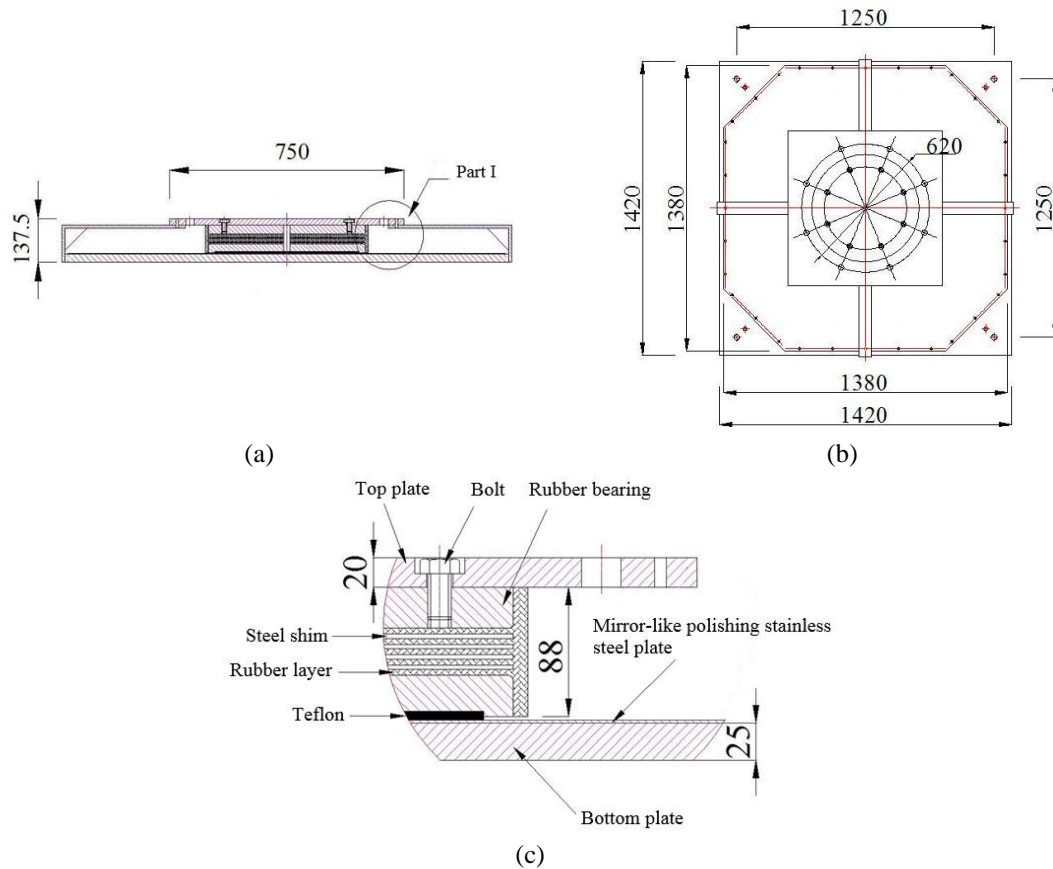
The schematic diagram of the Teflon-based lead rubber isolation bearing: (a) elevation view, (b) plan view and (c) details of part I
